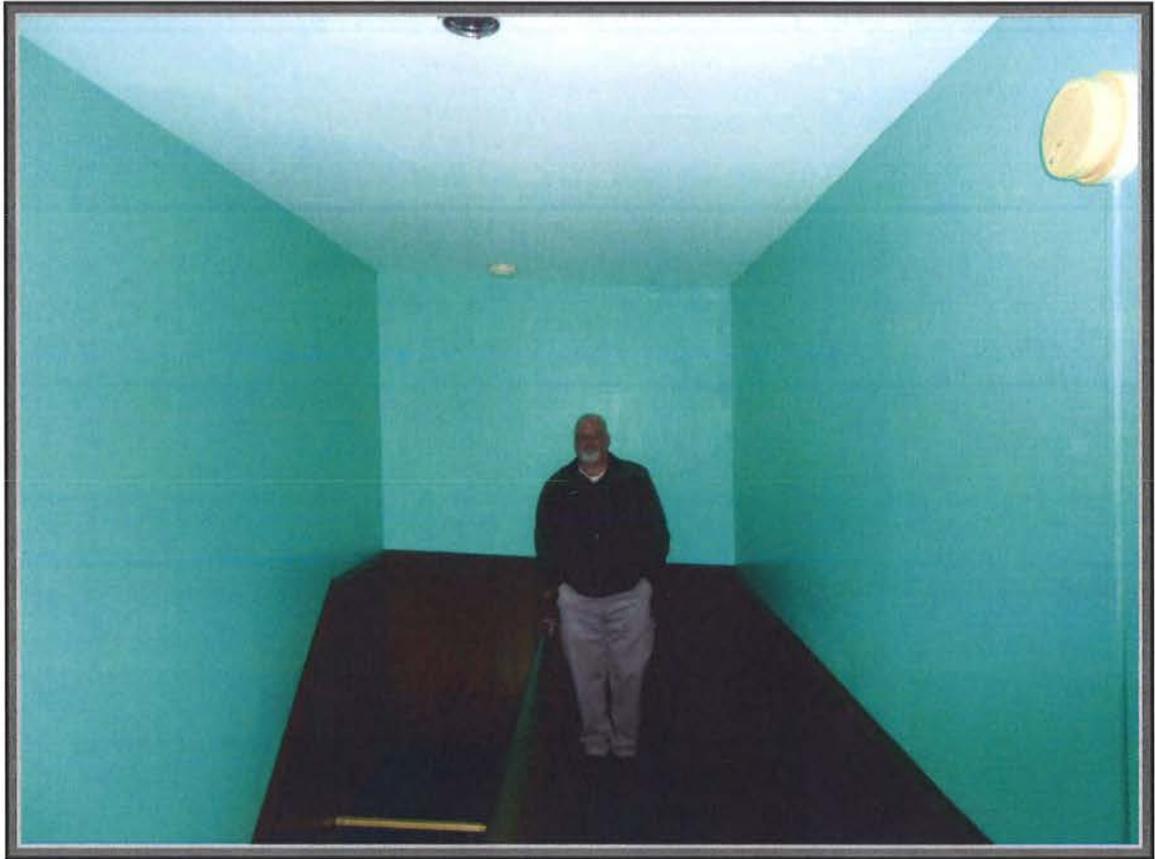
shows the missing guardrails and an open chase where hydronic heating copper piping was removed.
